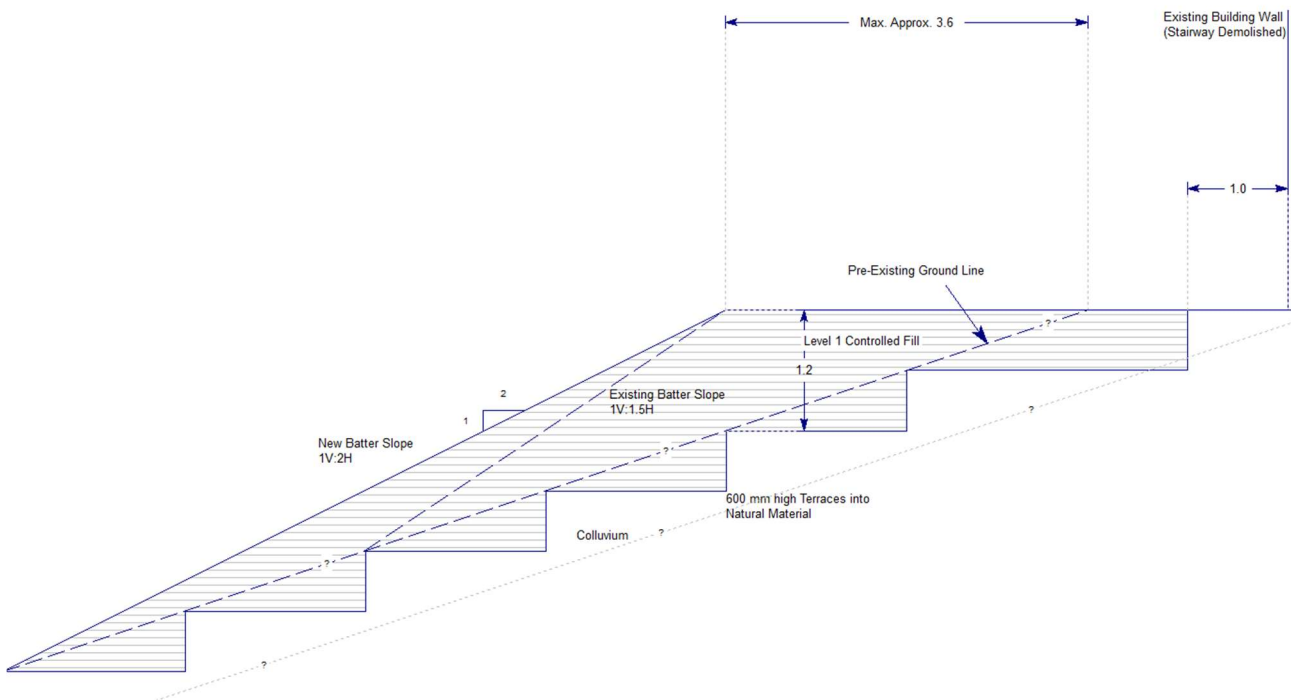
Conceptual Sketch of Controlled Fill Replacement for Support of the Extension.
